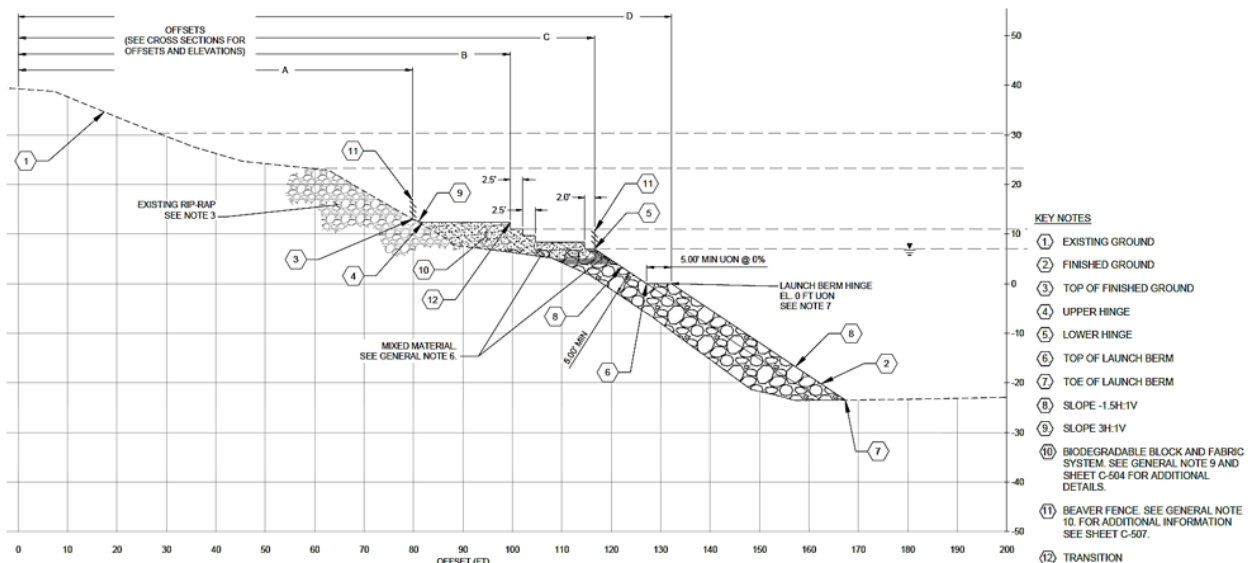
Example Cross Section. Figure shows show the approximate depth and thickness of rock revetment and launchable toe below 7 ft elevation (WSE). Above 7 ft, there would be either rock revetment with small crushed stone (choke stone) fill (Alternative 1), or a biotechnical erosion treatment (Alternative 2).
